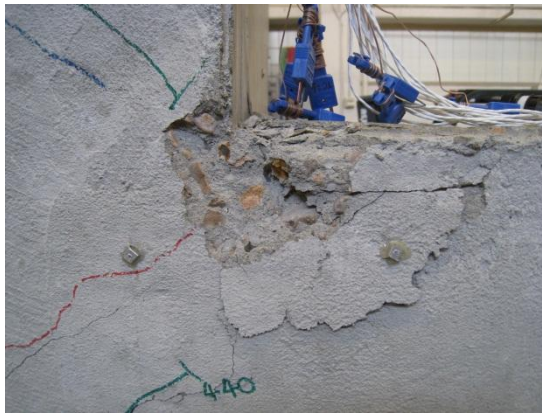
Overlapping U-Shaped Reinforcement in Beam-Column Joint Region
